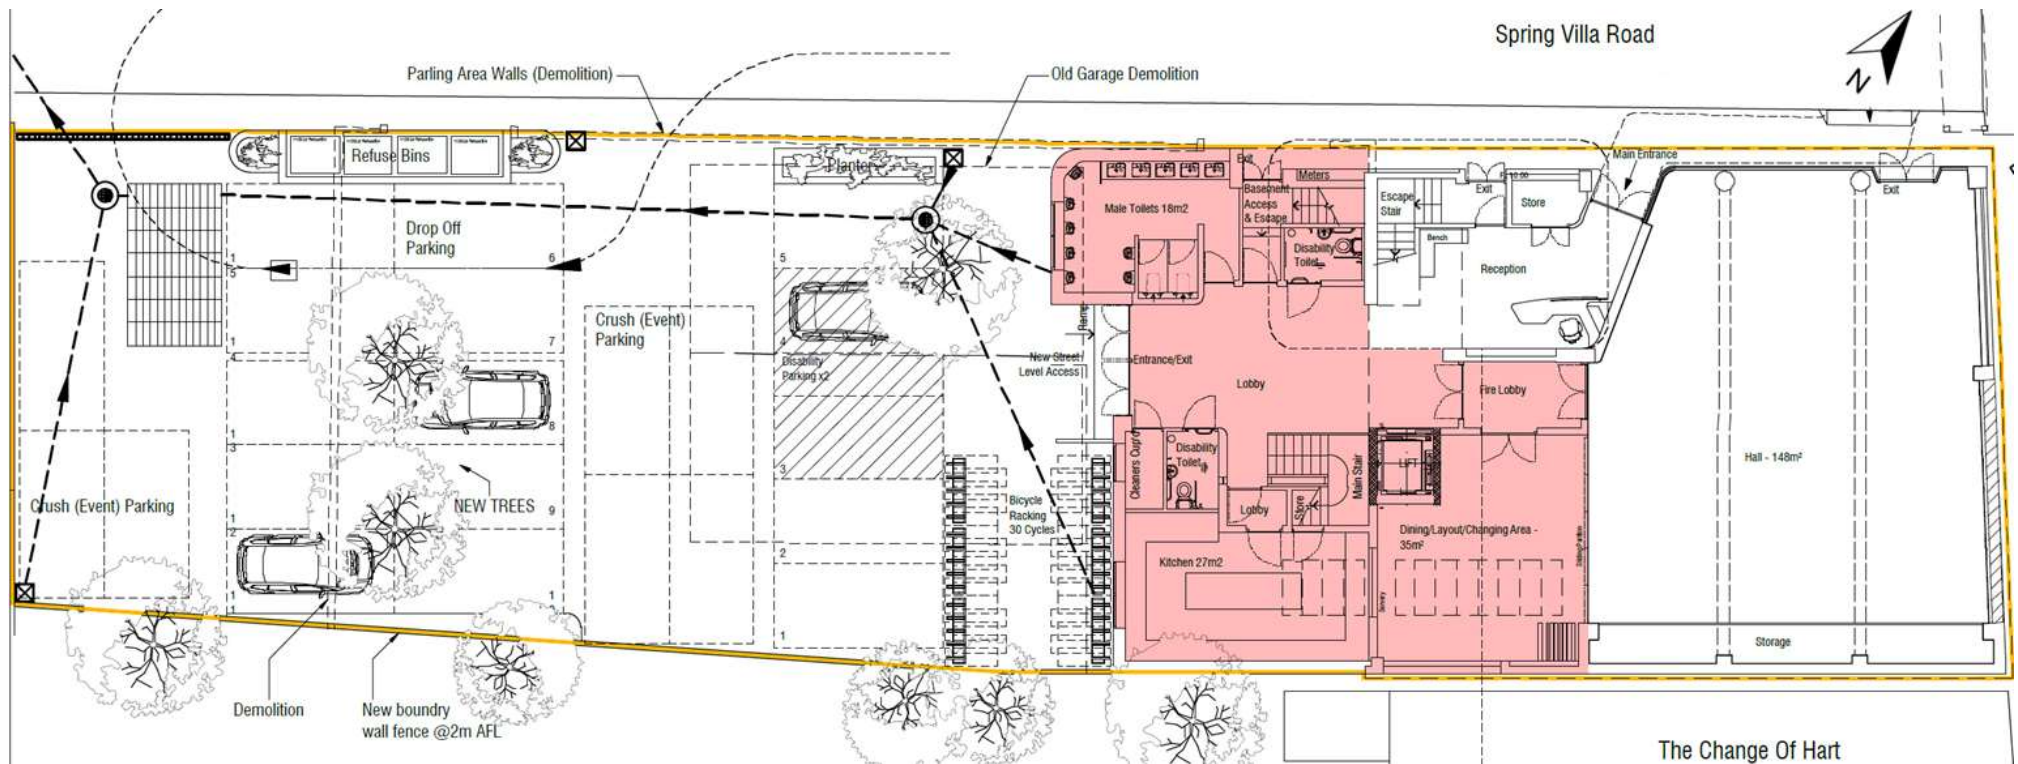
Ground floor/Site plan of the proposed development, with the area of groundworks (main rear extension and basement) highlighted.
